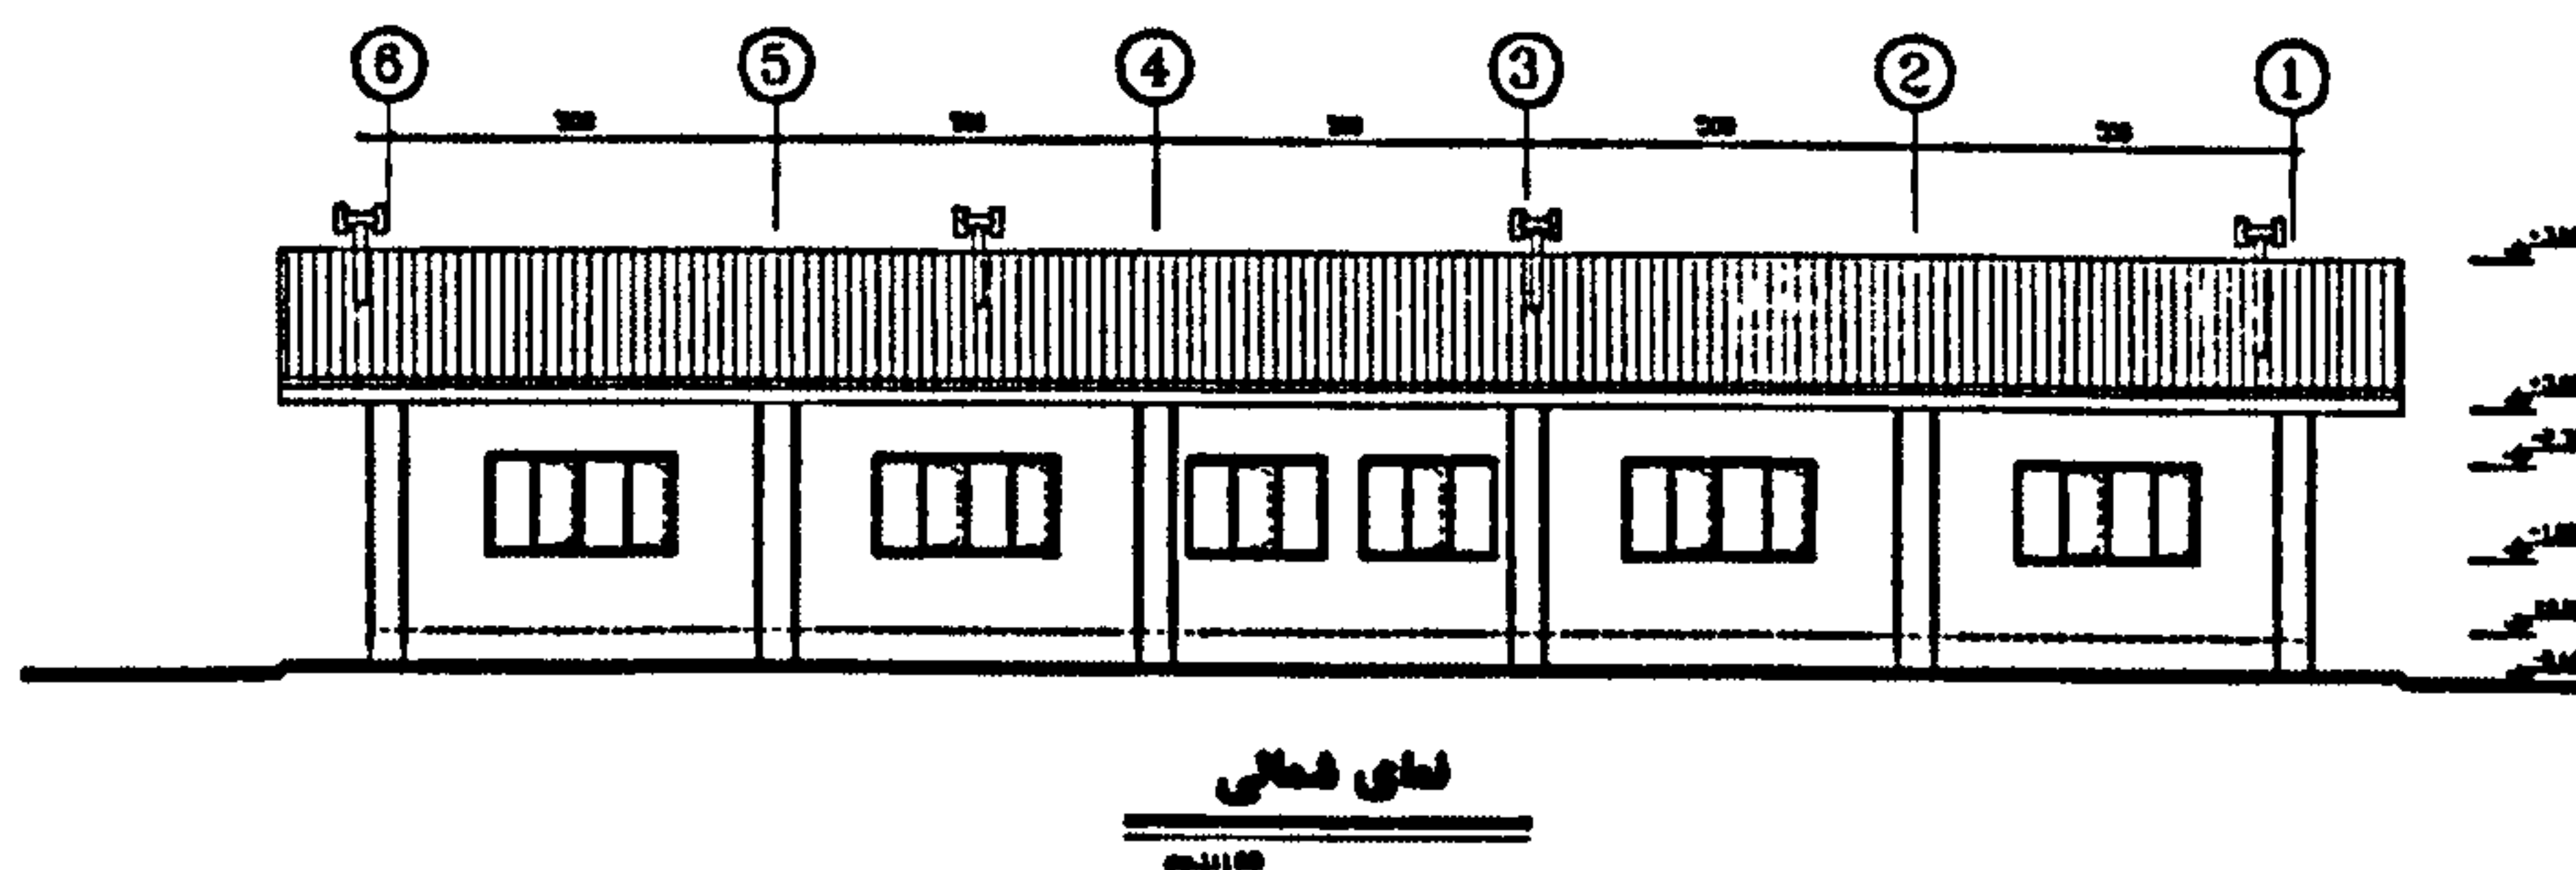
The north elevation of a secondary school with 3 classrooms (Number 2)
